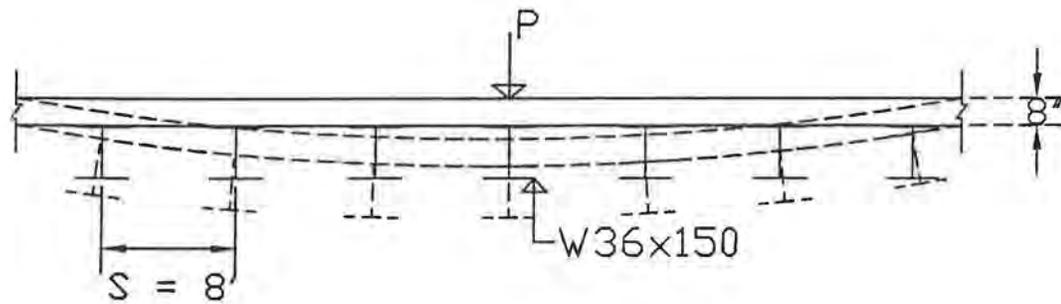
Modeling of Deck as a Beam on an Elastic Foundation
